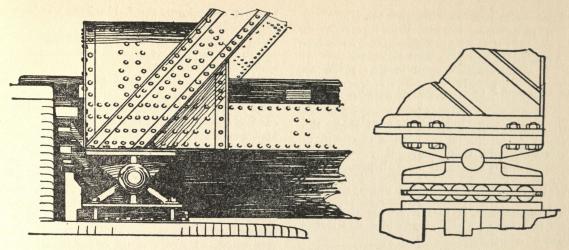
End Support of Bridge Girder, showing method of fixing members together.
